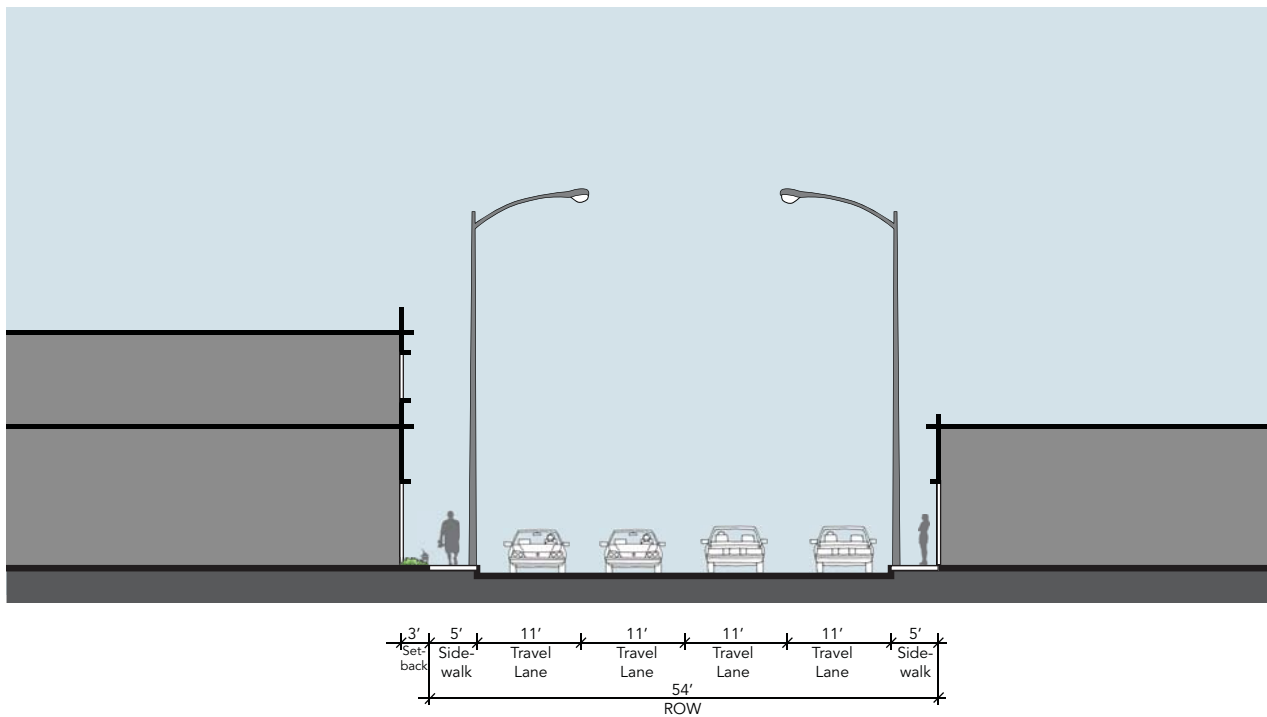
Existing Conditions (San Bruno Avenue facing west between San Mateo Avenue and US 101)
